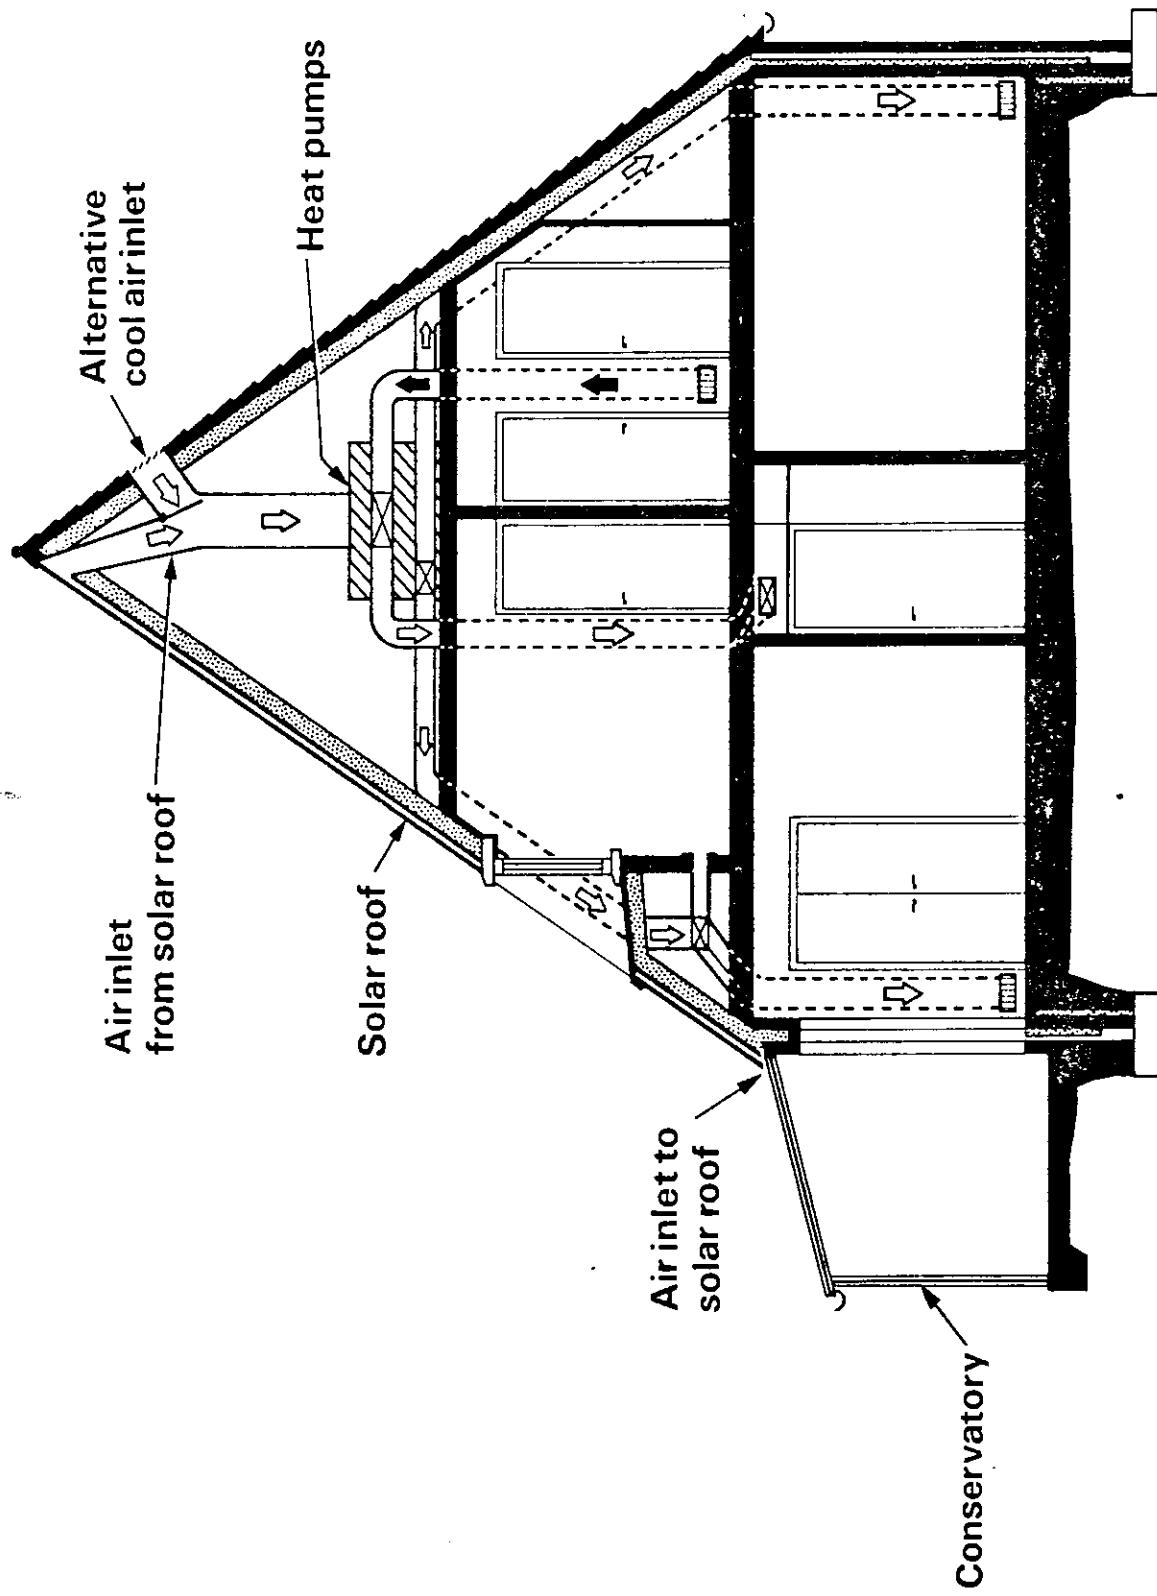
Heat pump house. Section showing layout of house, heat pumps and warm air ducting
